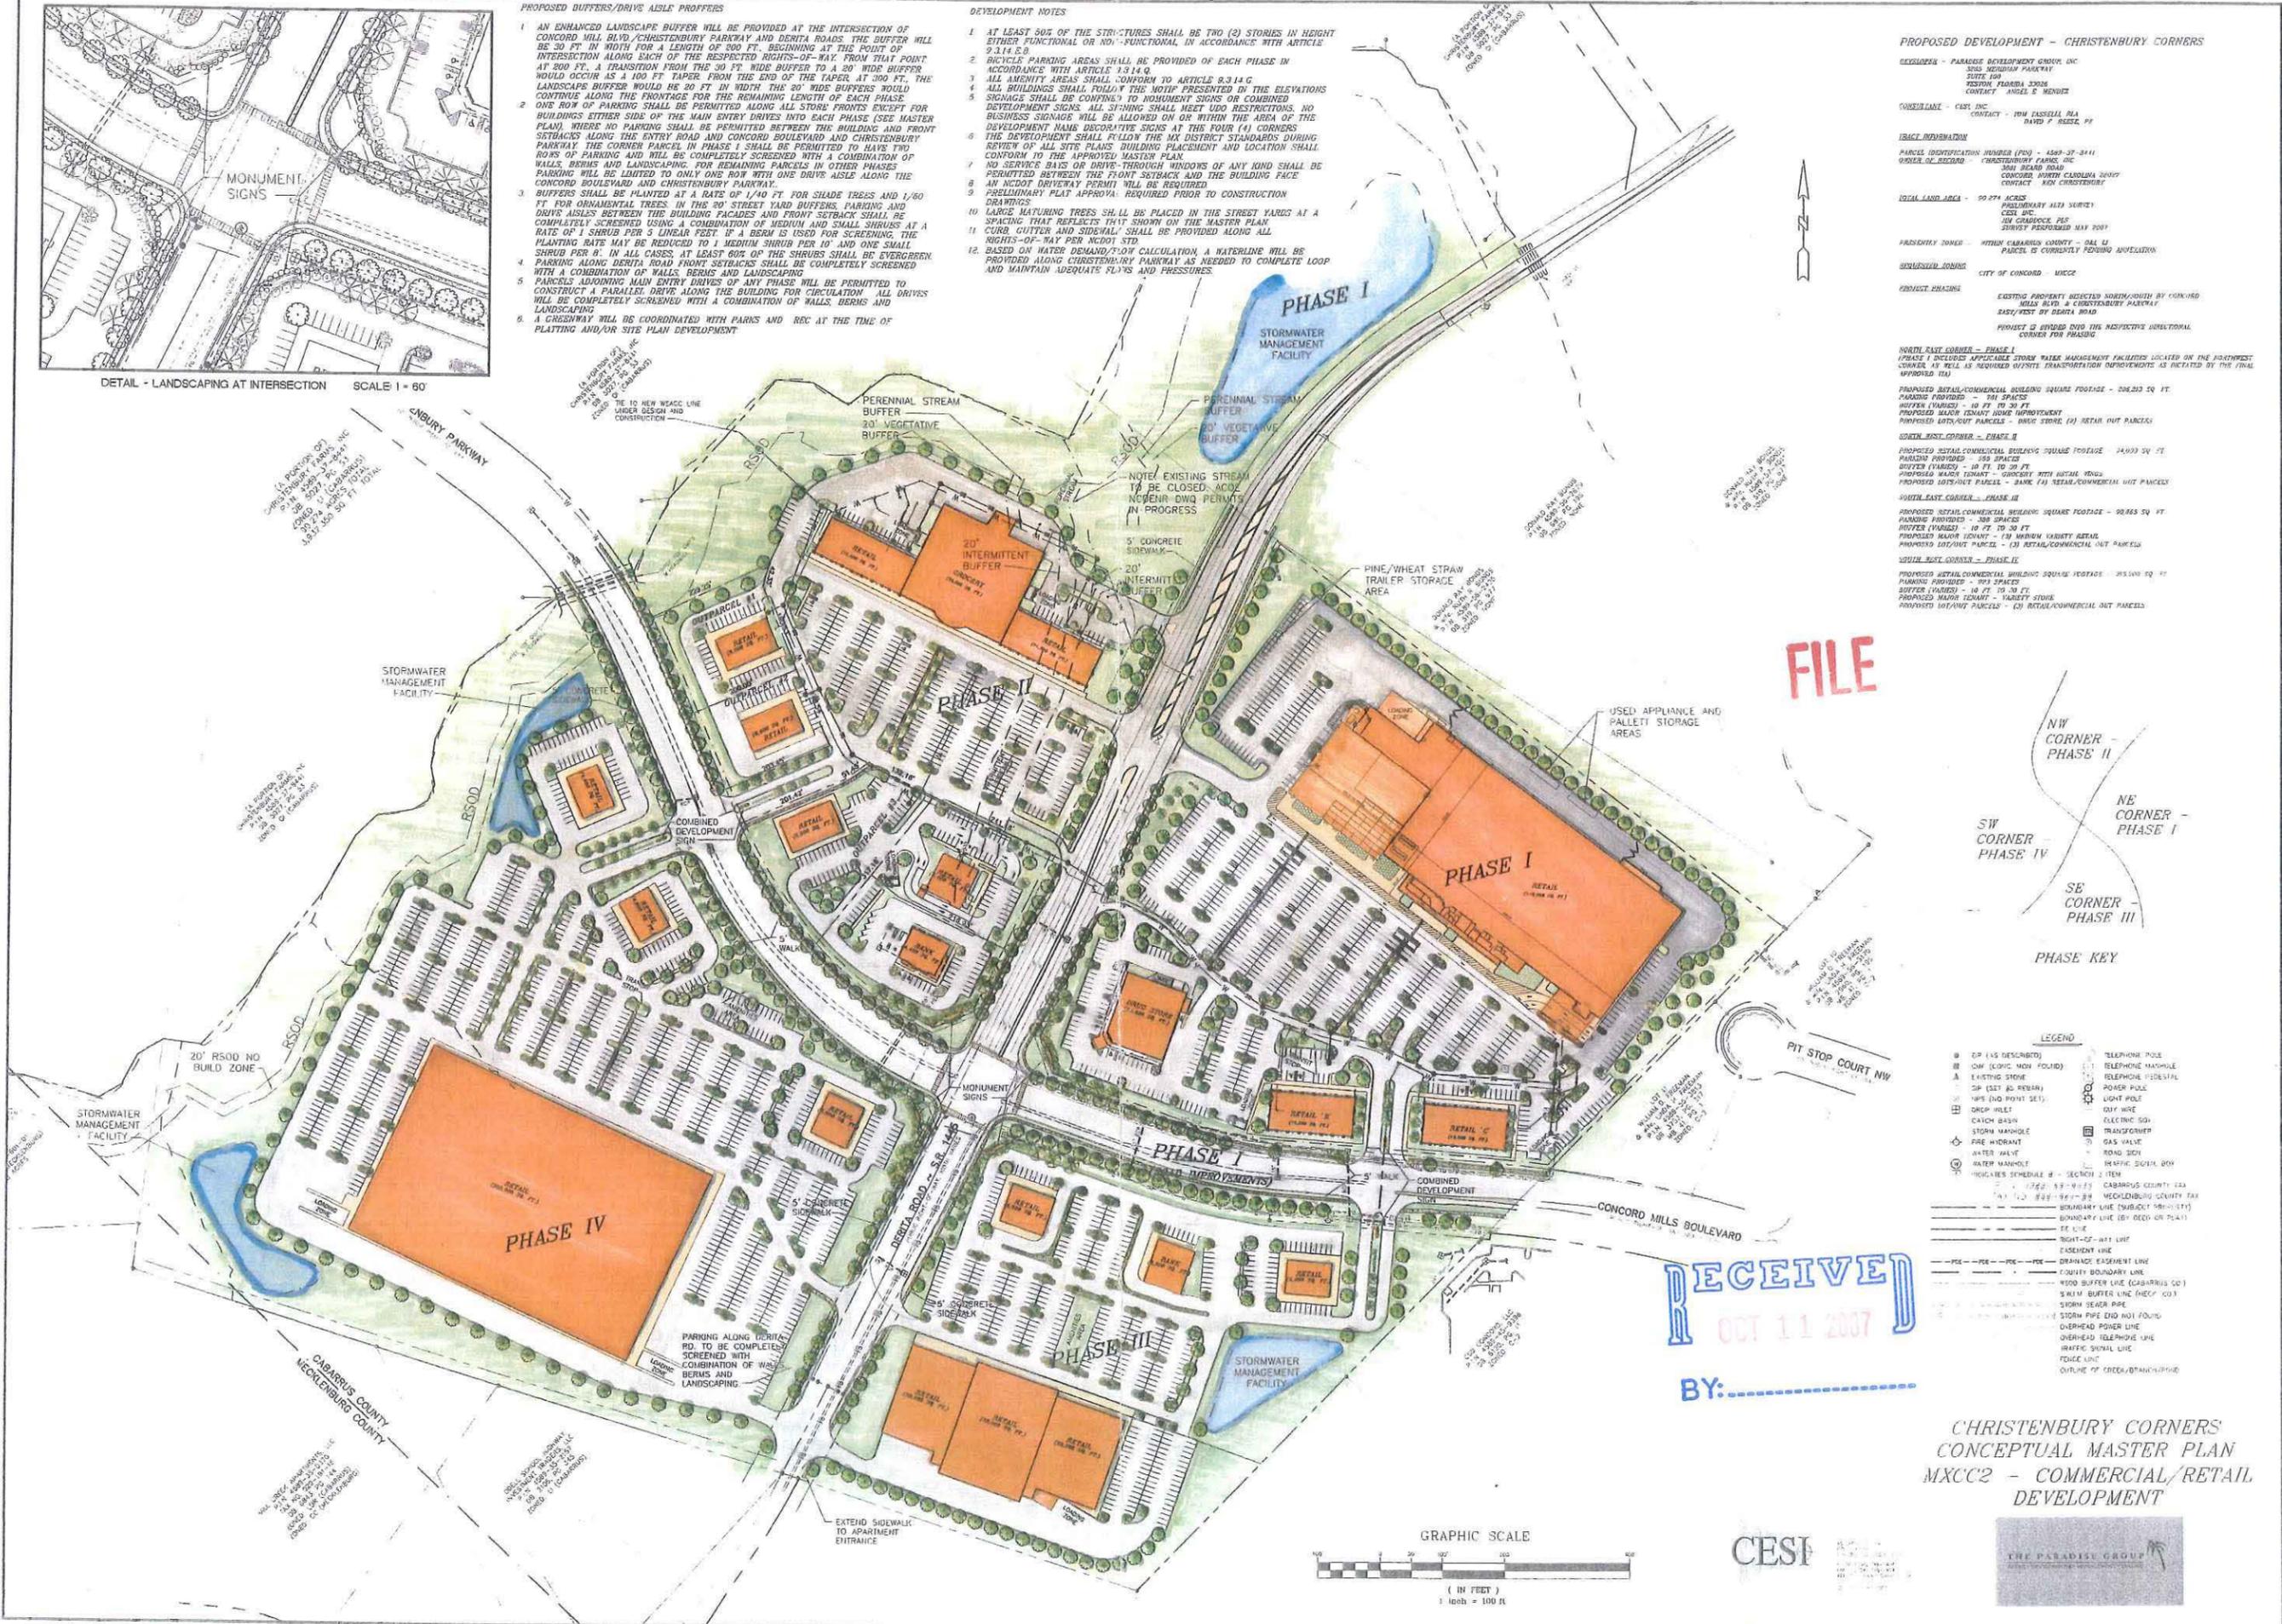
DETAIL - LANDSCAPING AT INTERSECTION SCALE 1 = 60
